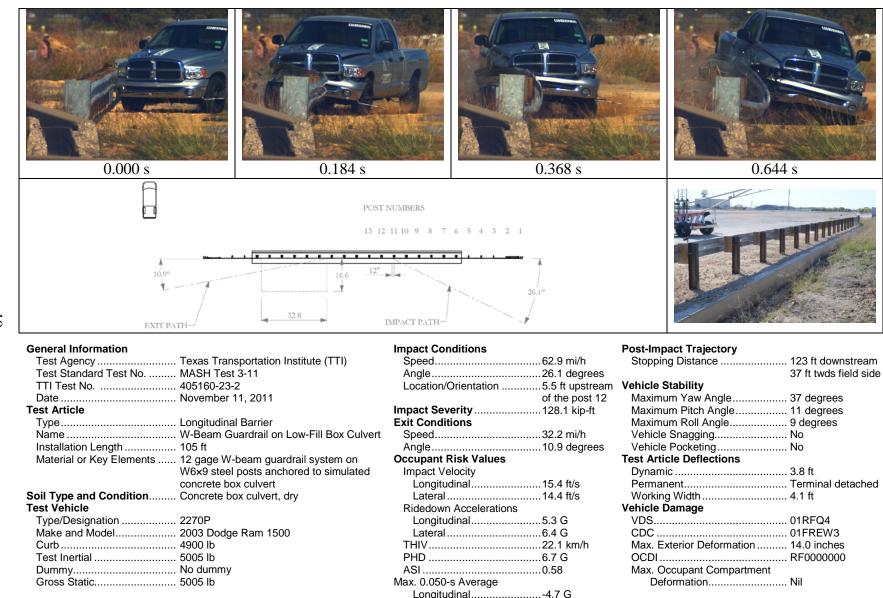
Summary of results for MASH test 3-11 on the W-Beam Guardrail on Low-Fill Box Culvert.
